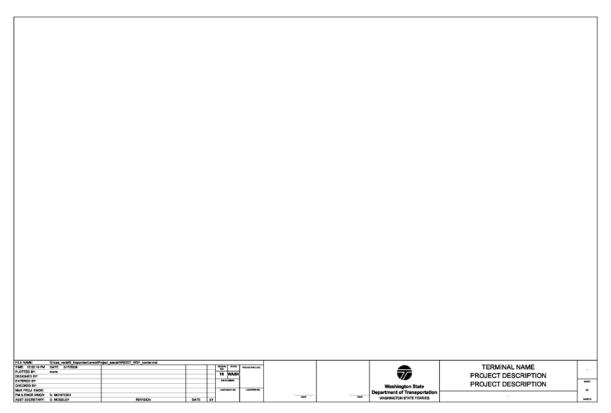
Sheet layout for WSF Design Plan drawings
